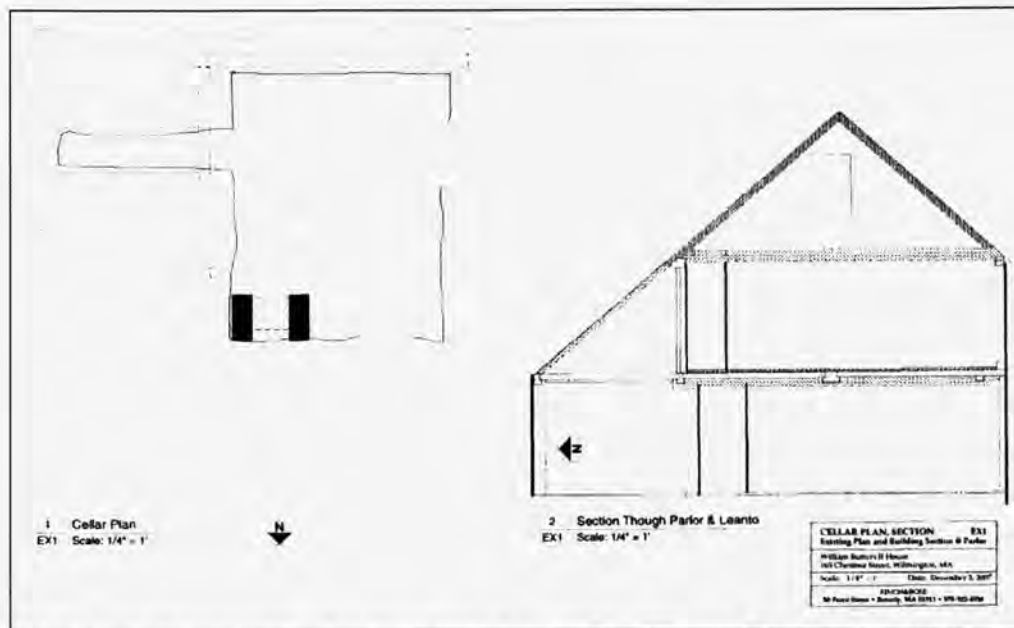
Plan of basement and section through west side of house. Drawing by Finch & Rose, 2007.
